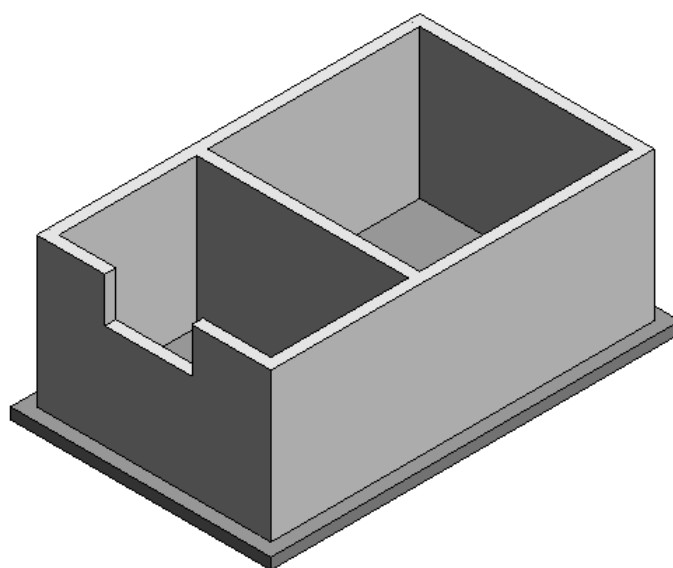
Case Study 1 Model (Concrete cast-in situ Chamber)
